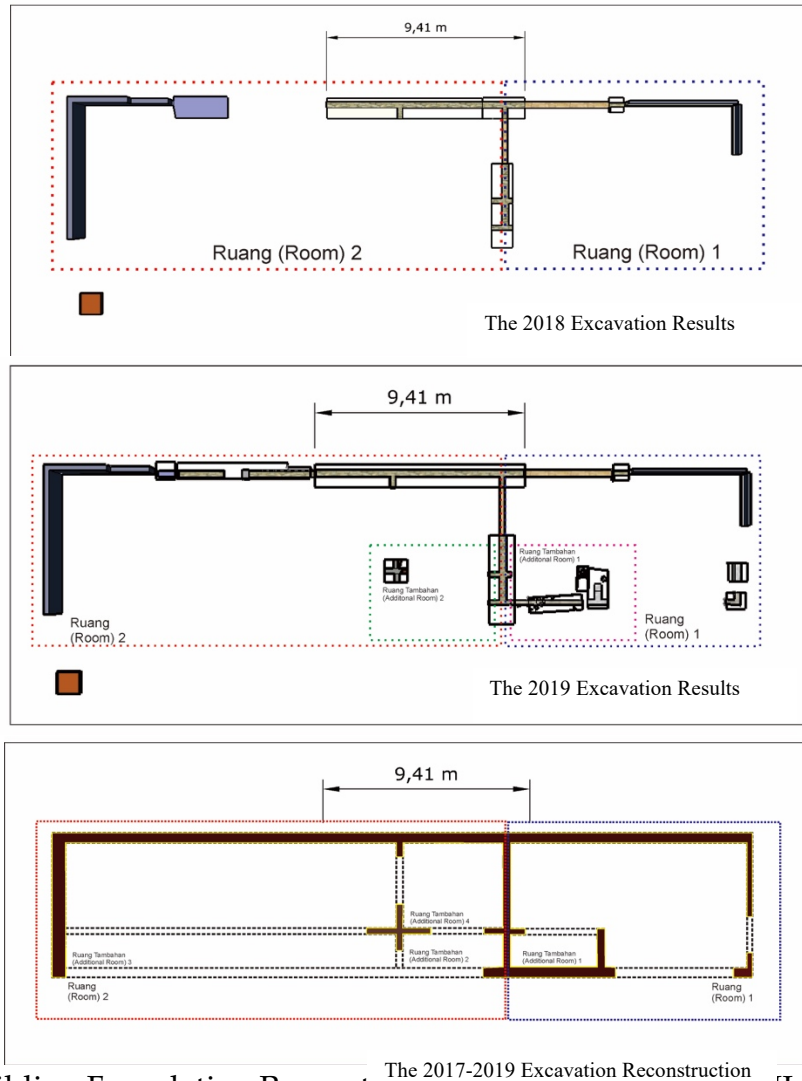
Building Foundation Reconstruction at A1 Area, Kendari II Airfield Area
